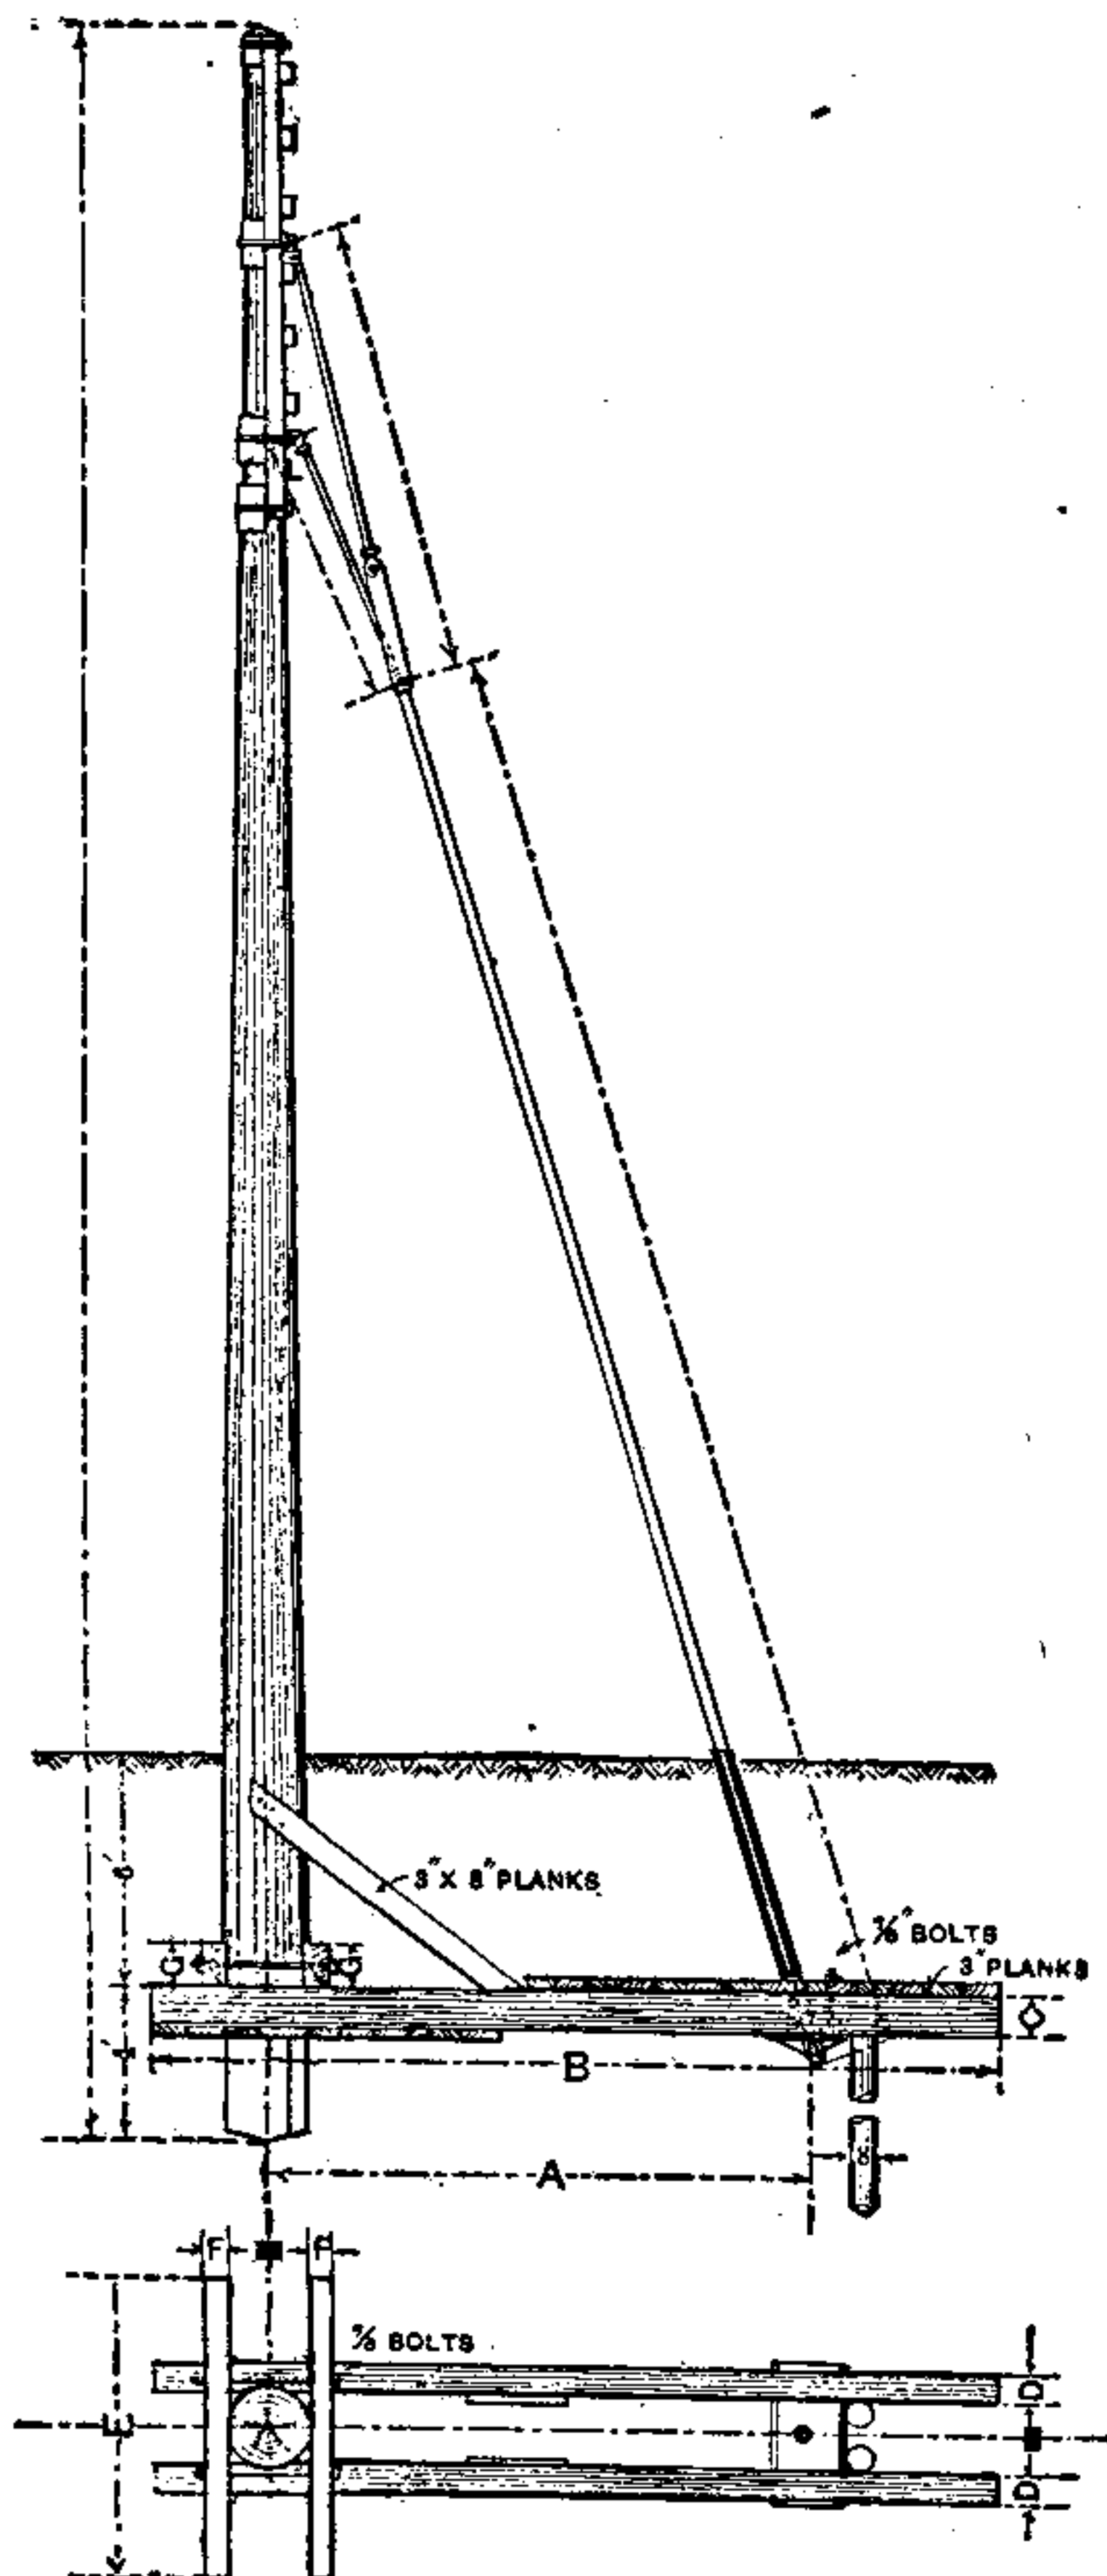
ELEVATION AND PLAN OF COMPOSITE ANCHOR POLE.
